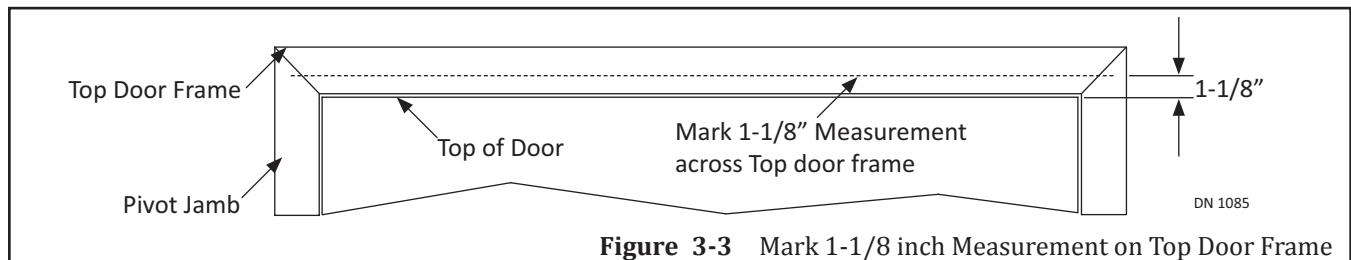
Mark 1-1/8 inch Measurement on Top Door Frame
